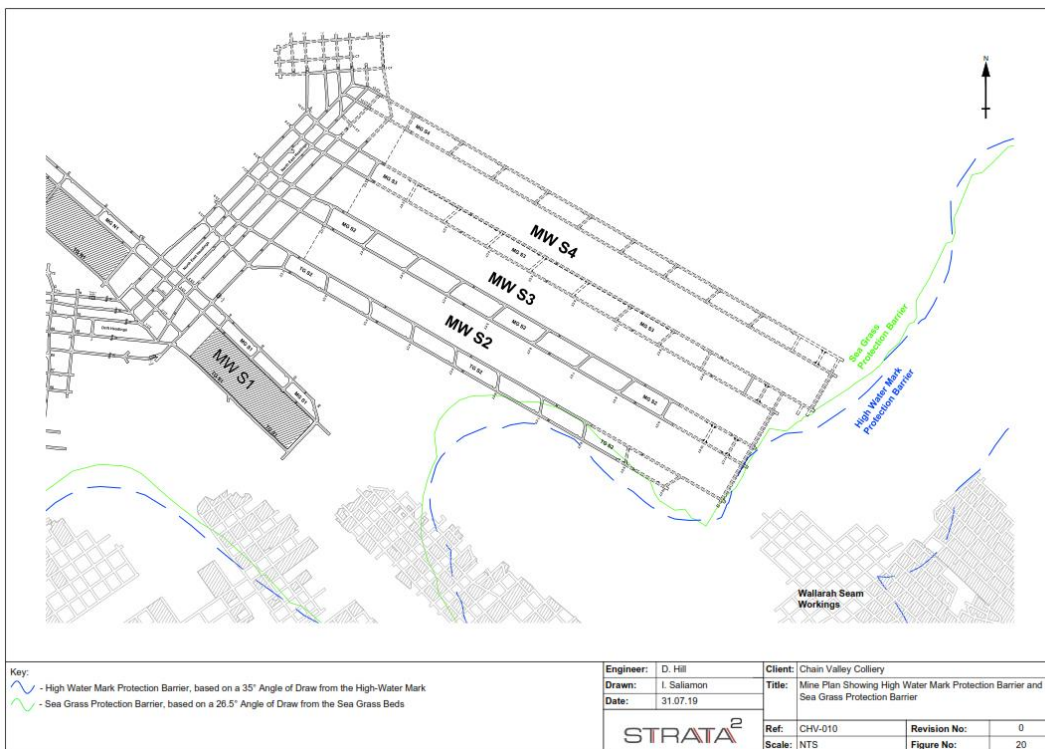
S2, S3 and S4 Miniwall (MWS2, MWS3 and MWS4) Protection Barriers and Wallarah seam workings location (Strata2, 2019)
